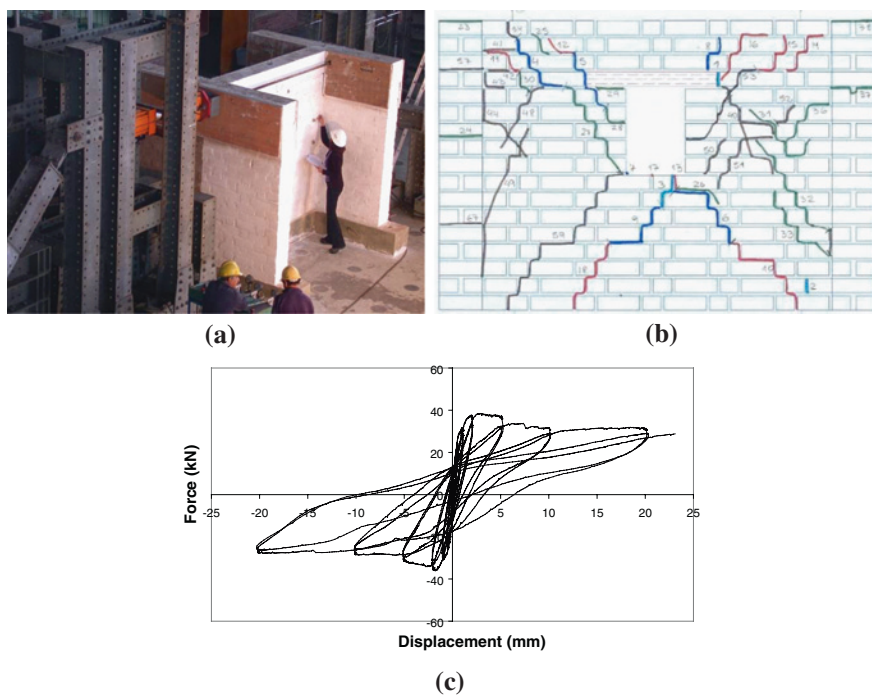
Cyclic test carried out on a double-T wall [27]. a Tested wall. b Damage pattern evolution during the cyclic test. c Cyclic test carried out on a double-T wall [27]
